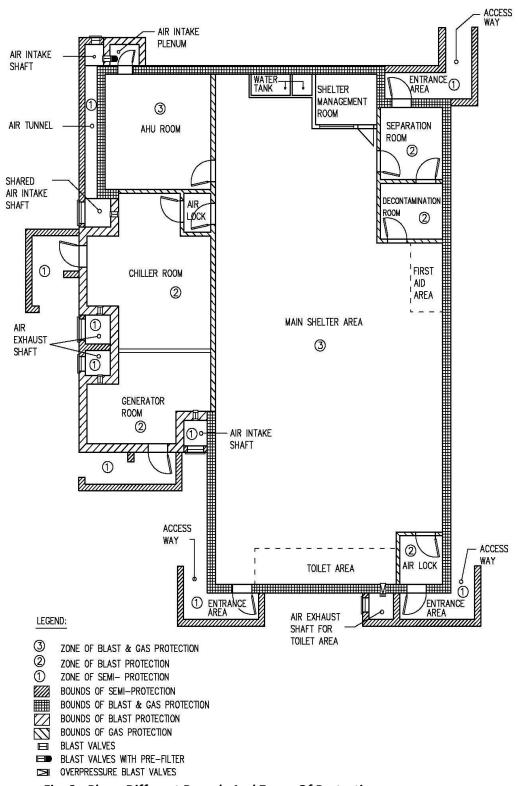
Plan - Different Bounds And Zones Of Protection For A Typical Shelter Layout
